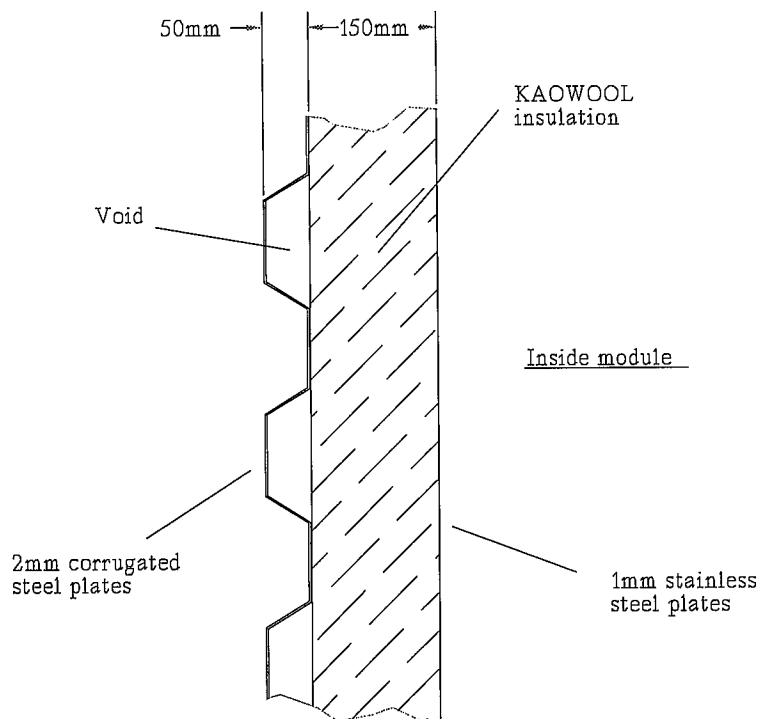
Cross-sectional view showing the construction of the MFTR wall.
